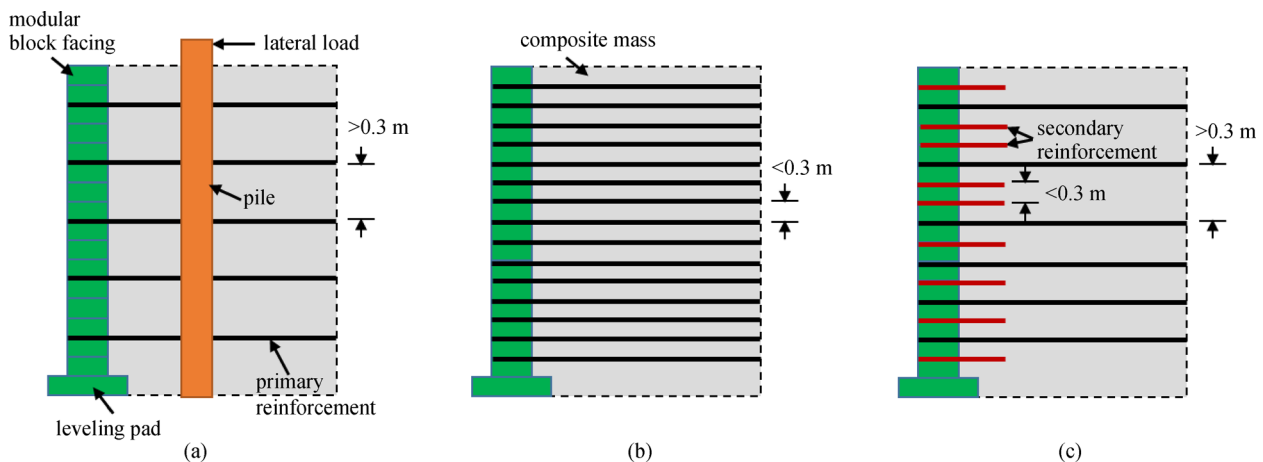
Recent applications of GRR walls. (a) Pile in GRR wall; (b) GRS wall; (c) Hybrid GRR wall
